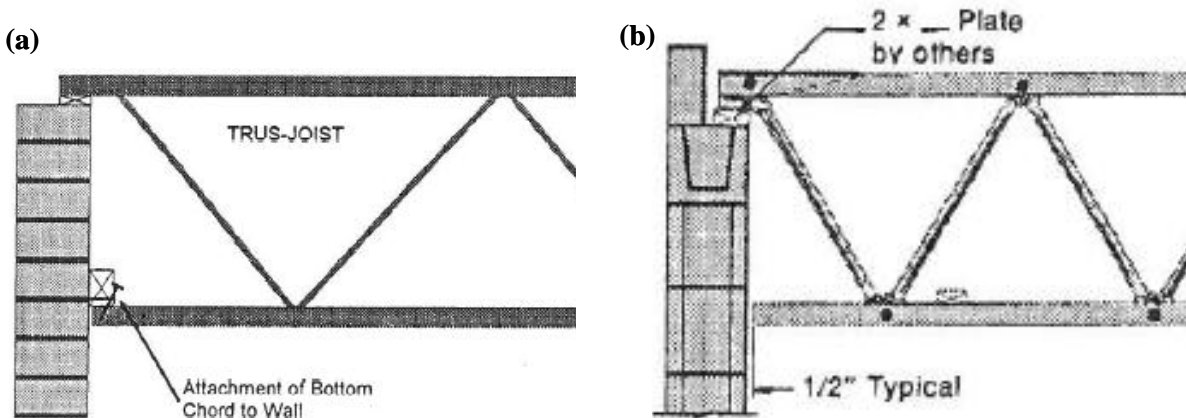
(a) Wall-joist detail as constructed and (b) bearing detail from TRUS-JOIST Design Manual (J.R. Harris & Co. 2011).
